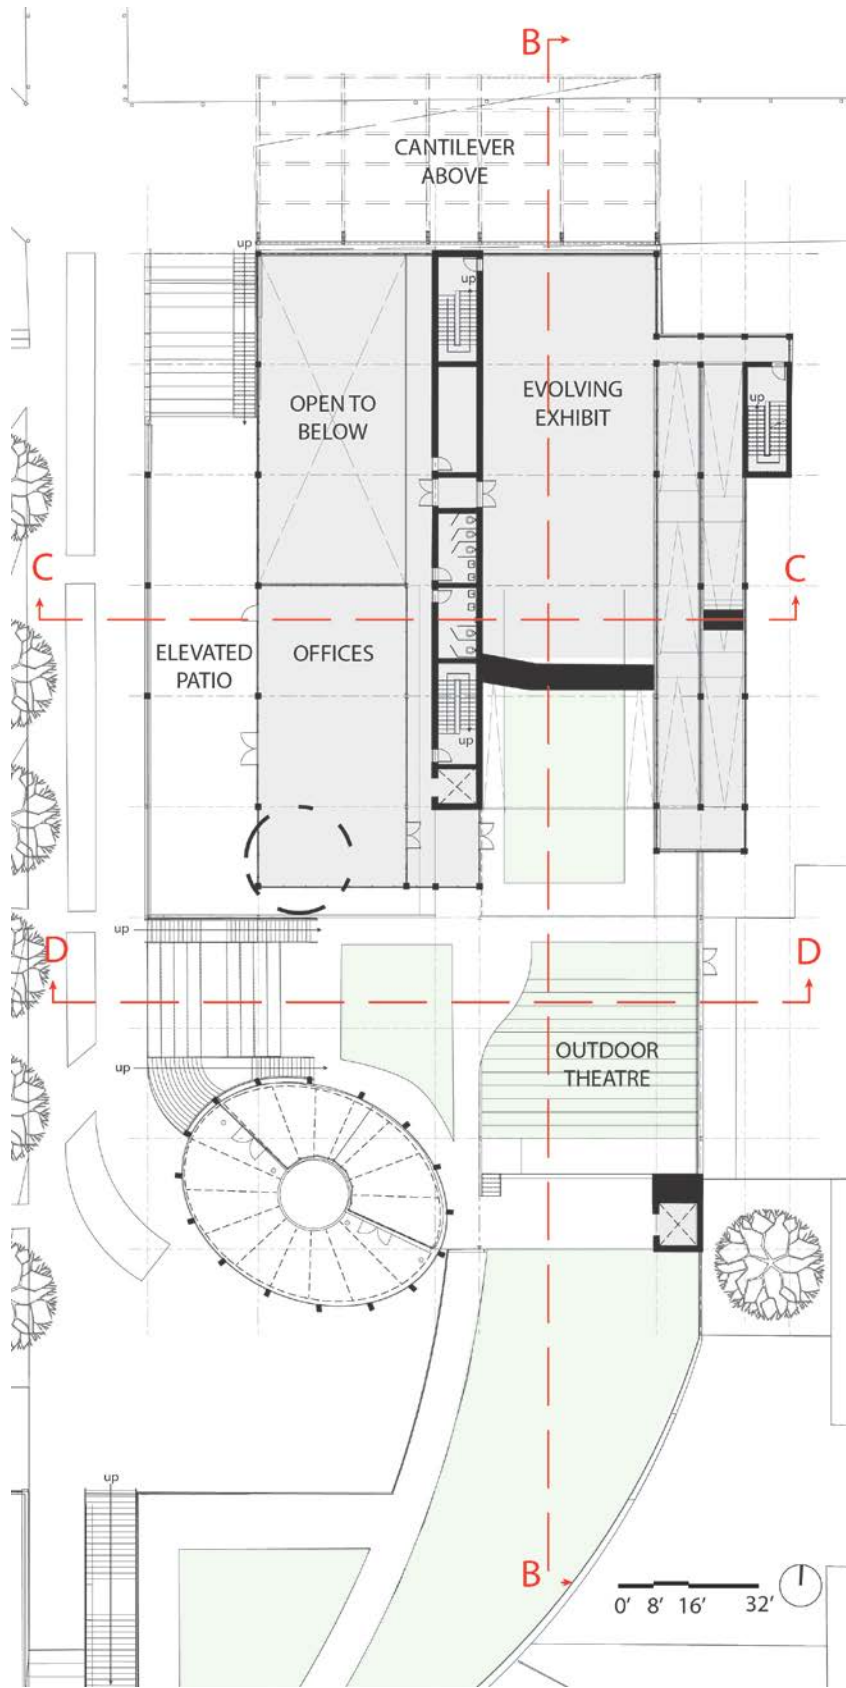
Second floor plan, Museum, Final design scheme, image by author.
